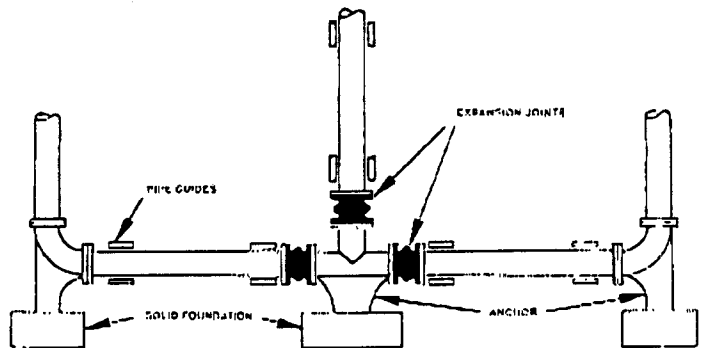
B: Typical Piping Layout Utilizing Expansion Joints And The Proper Use Of Anchors In Branch Locations
